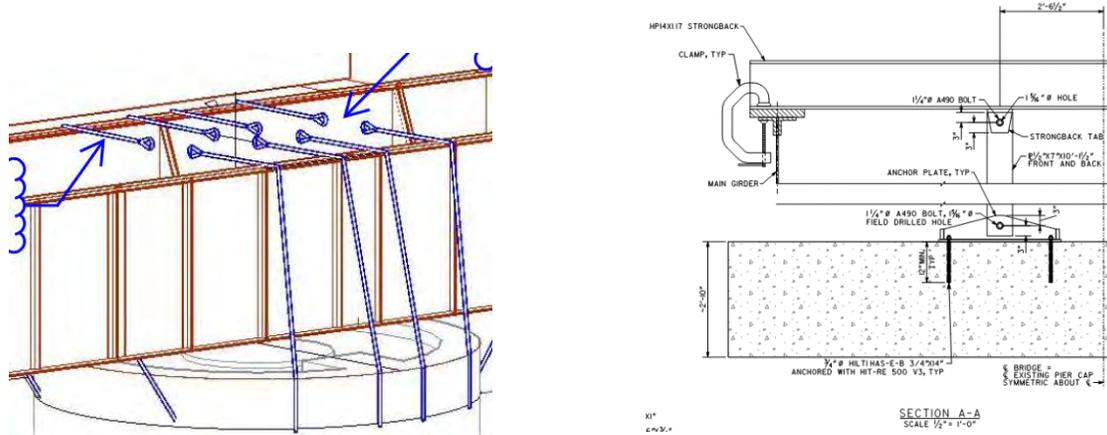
Conceptual Basket Hanger System (left) and Strong Back Beam and Anchor Plate System (right) – Heath & Lineback Engineers
